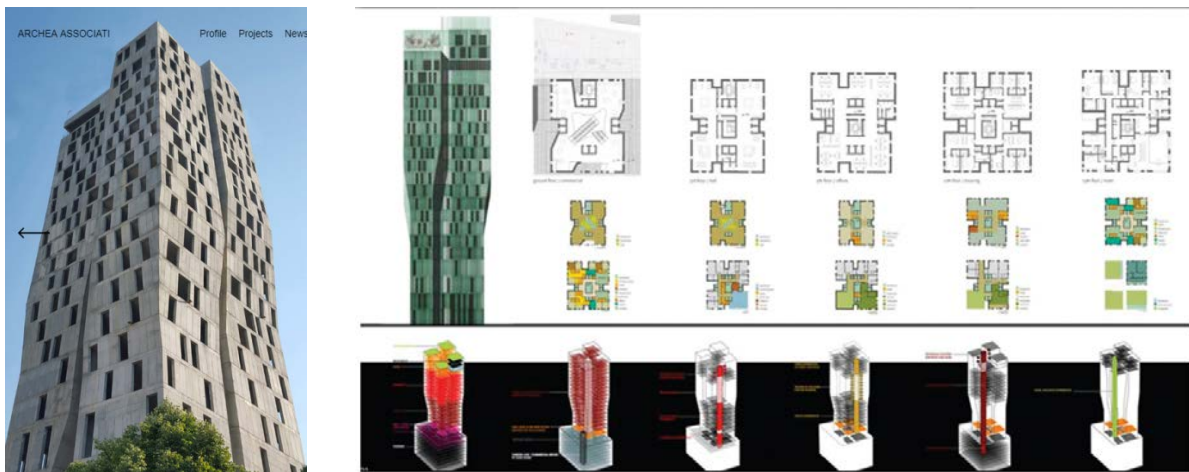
Computer Digitized floor plans, elevation and 3D view of Forever Green Tower in Tirana
